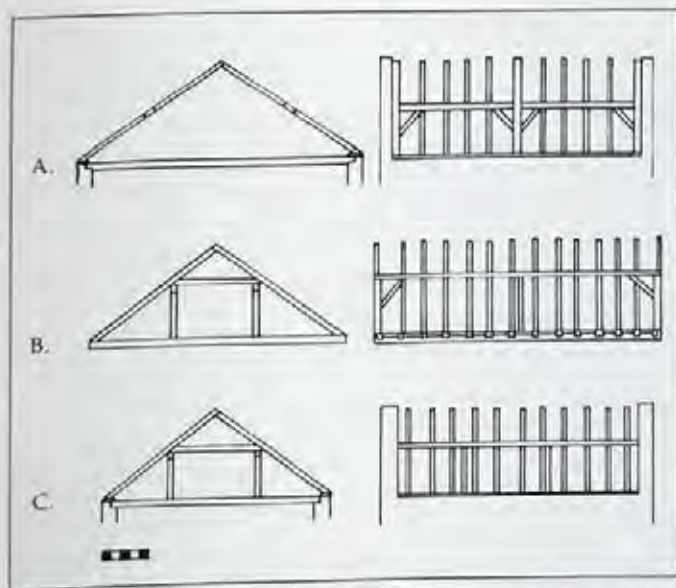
Roof framing: A. Butt purlin, principal rafter roof, John Stigerwalt House; B. Through purlin, common rafter roof, Snapp House, Shenandoah County, Virginia; C. Through purlin, common rafter roof, Jesse Horne House; vicinity of Applebachsville, Bucks County, Pennsylvania.
